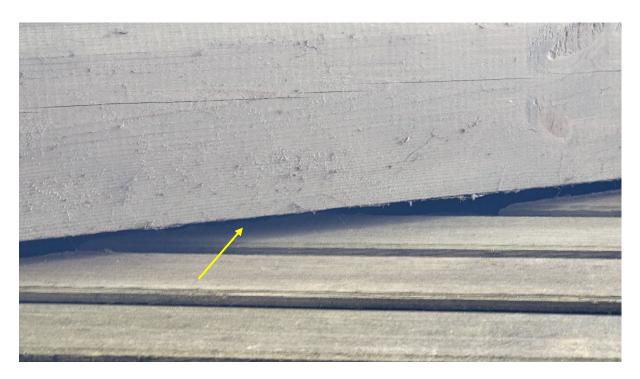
Gap behind soffit on the north elevation allowing potential access for bats (yellow arrow)
